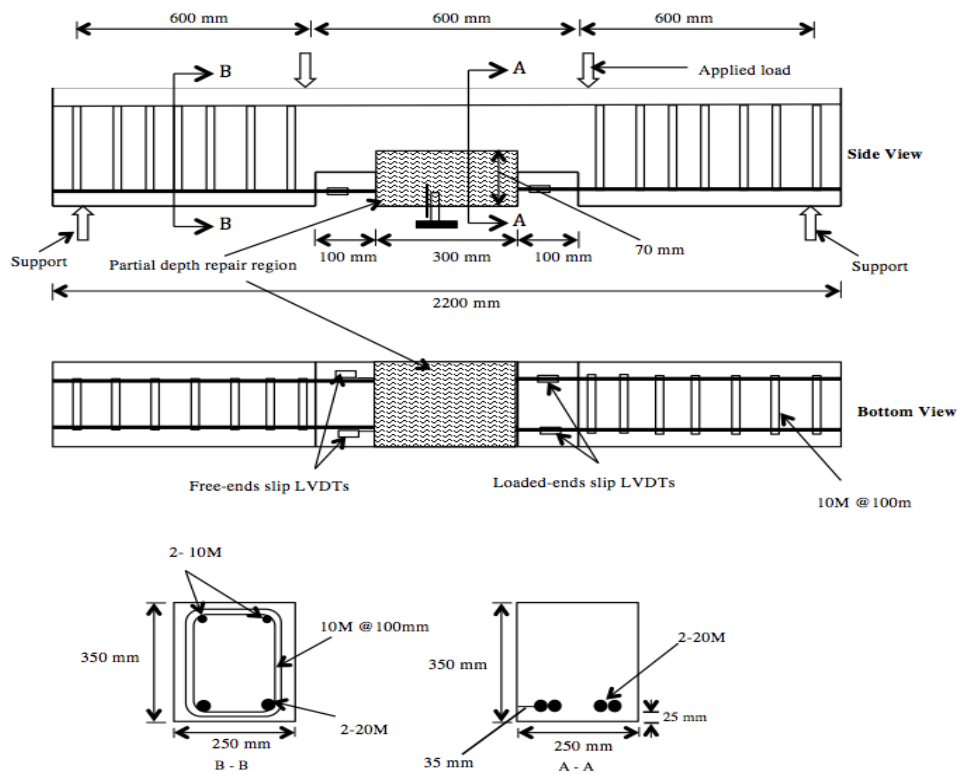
The cross section and reinforcement details of the lap splice beam
